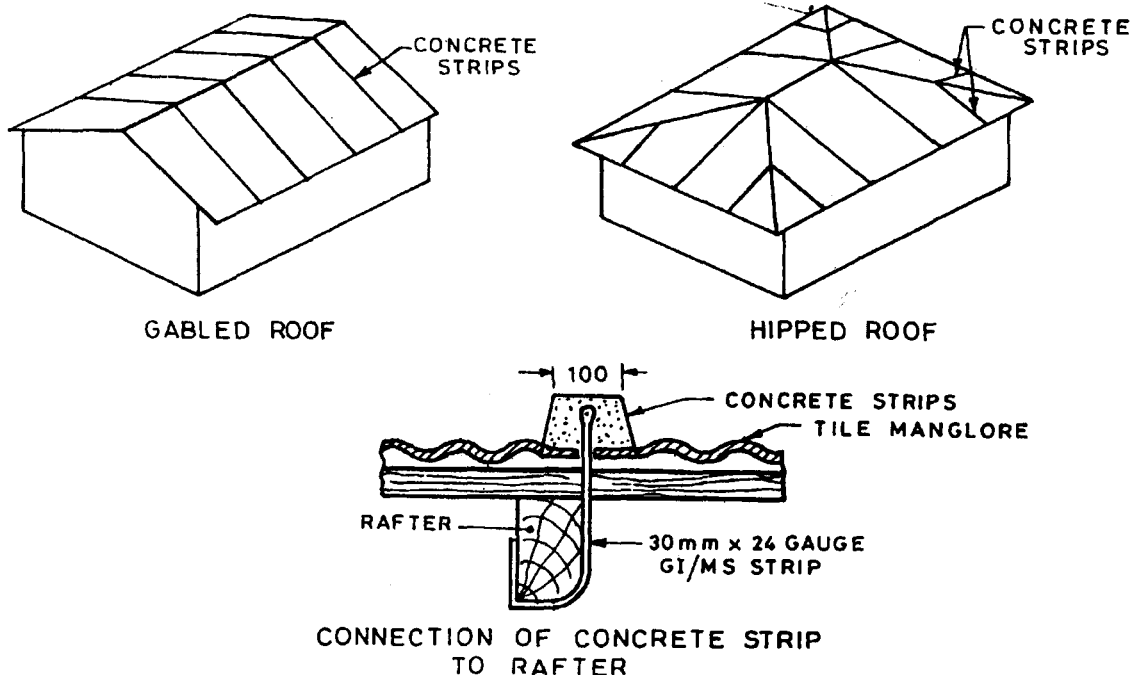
IMPROVEMENTS TO TILED/AC SHEETS ROOF TO REDUCE DAMAGES DUE TO CYCLONES
